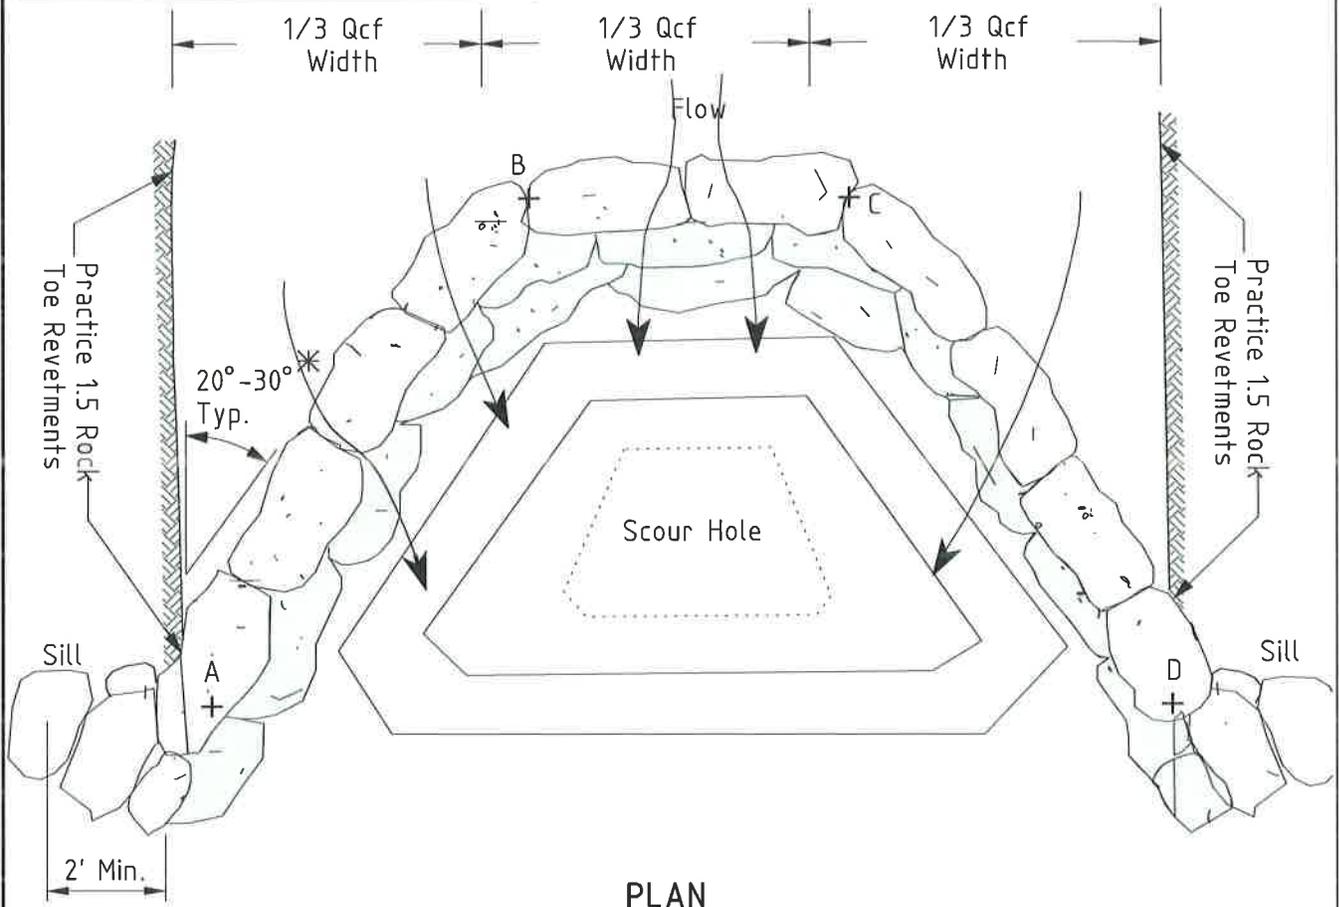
Typical sealing detail for rock grade control structures. Adapted from Buck Engineering.
